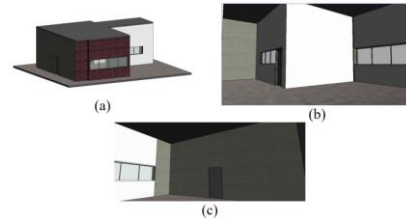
(a) Allocated materials to outside walls (brick cladding, concrete block, dry wall system)- (b) and (c) Allocated materials to inside walls and floor (dry wall system, concrete block, and carpet)
